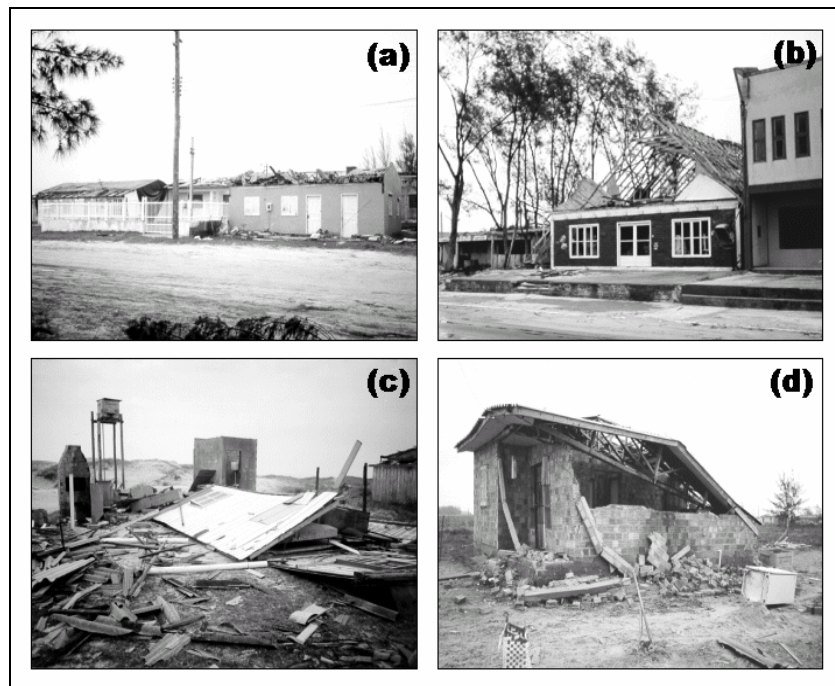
Type of damage caused by wind force at Balneário Gaivota (SC): (a and b) roof failure and collapse; (c and d) collapse of non-engineering wood framed and brick houses.
